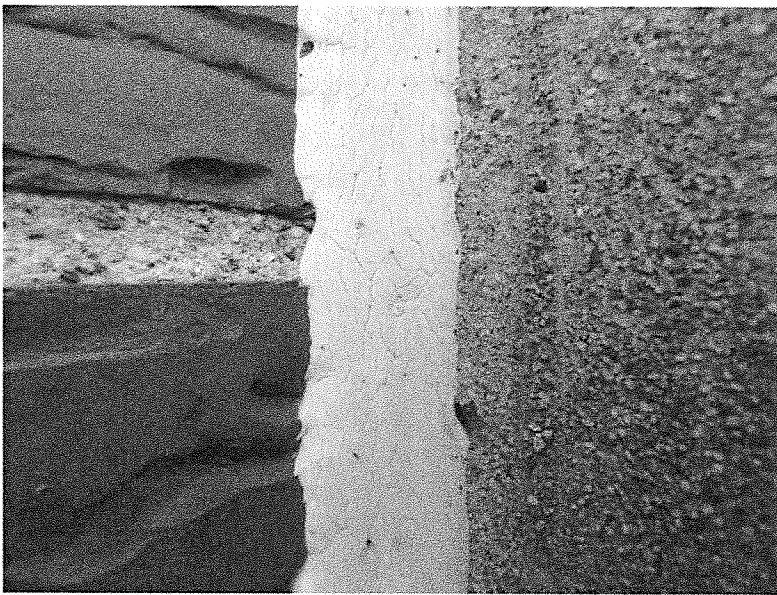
Crazed, hard, and brittle sealant in corner joint at west facade
